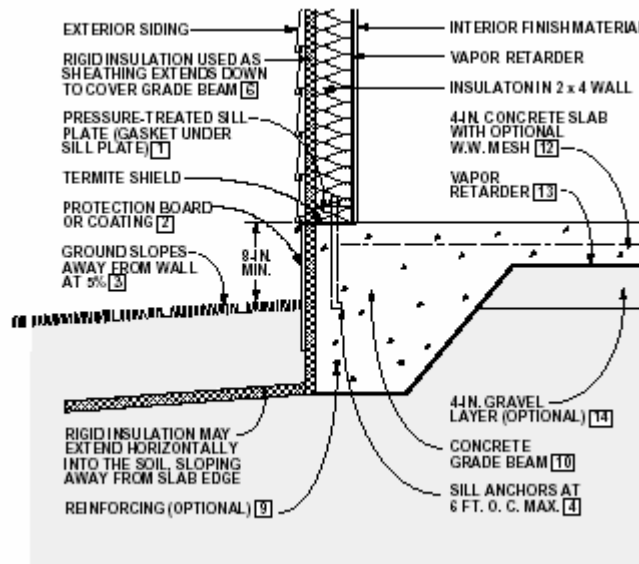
illustrates a slab-on-grade foundation with an integral grade beam. The rigid insulation is placed vertically on the exterior face of the grade beam. Additional insulation may be extended horizontally around the foundation perimeter.
